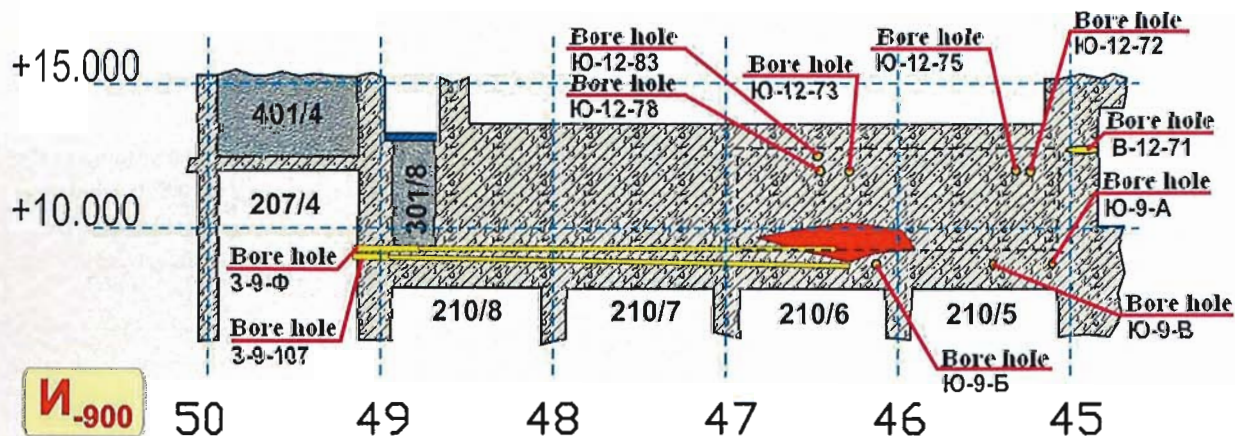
Separating wall between Room #305/2 and Room #304/3. Section through 'U<sub>900</sub>' row. The red spot indicates the location of lava.
